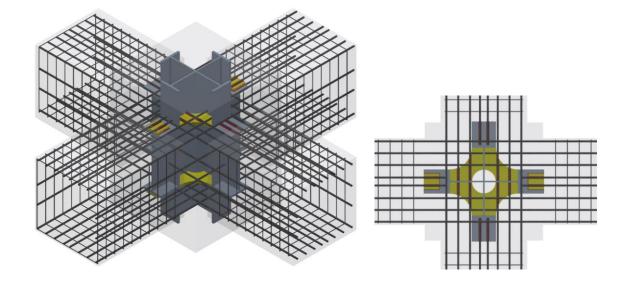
Moment connection between concrete beam and concrete encased steel column with bi-directional reinforcements on same sides of internal diaphragm plate and flange of steel corbel
